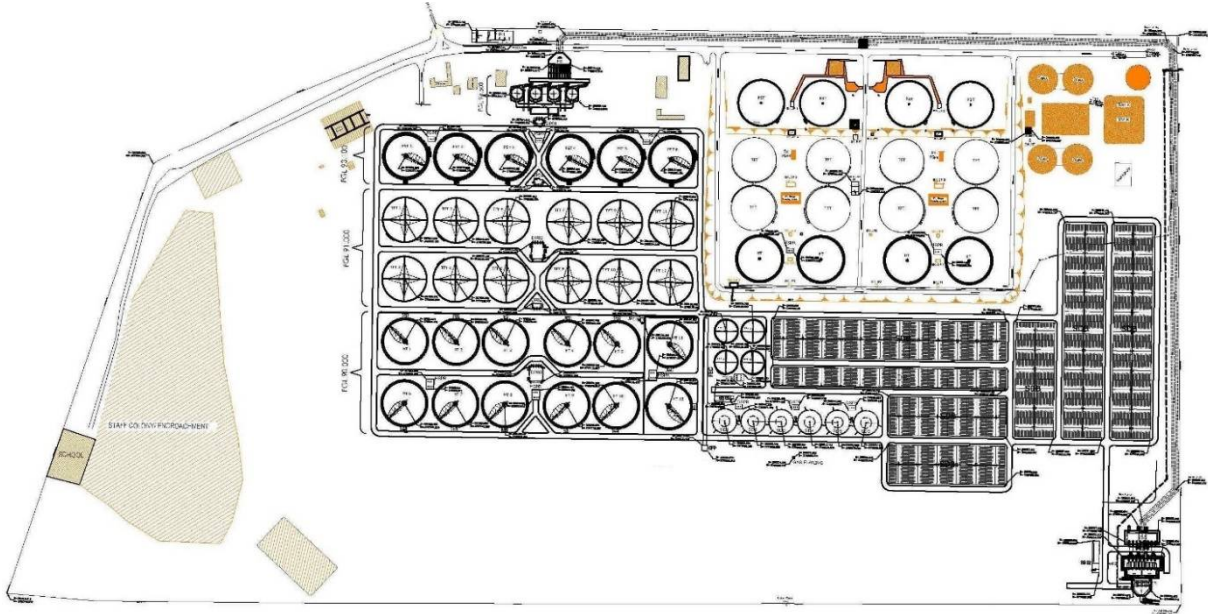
Design Layout of Works in Ongoing Construction Contract on TP1 Site
